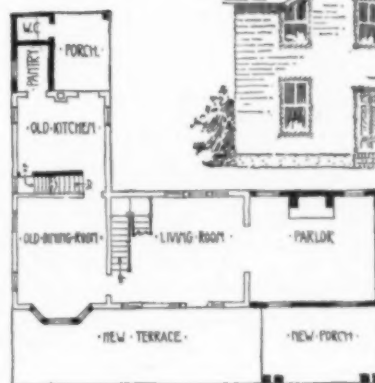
THE ORIGINAL TWO STORY AND ATTIC HOUSE
